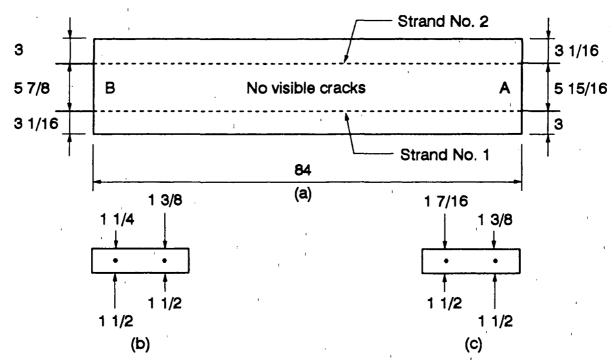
Specimen No. 4-3.0TC-1 (dimensions shown in inches):
